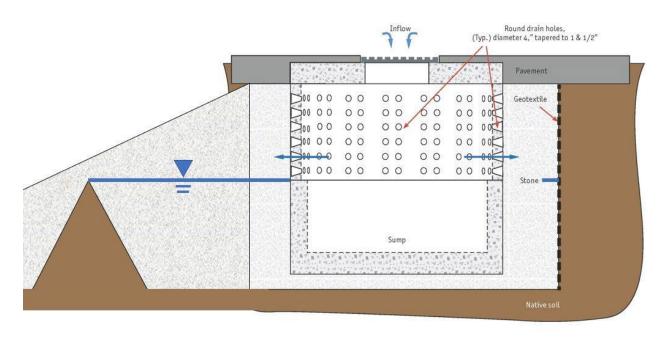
Typical SCM cross-section (not to scale). Source: New England Stormwater Retrofit Manual (VHB, UNHSC 2022)
